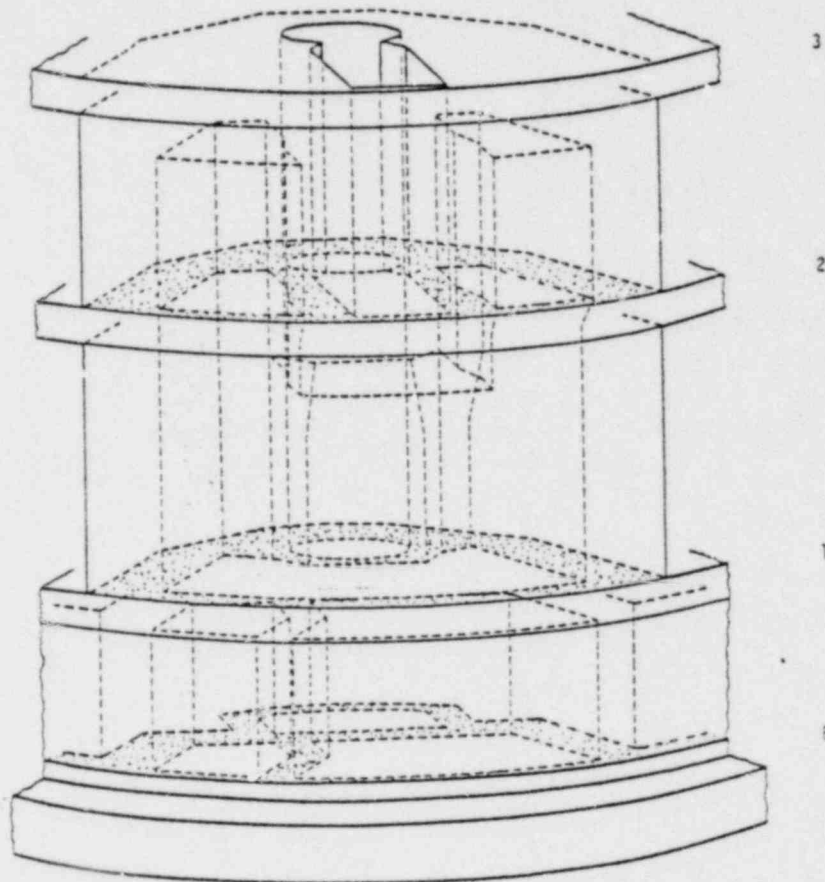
ISOMETRIC VIEW OF CONCRETE CORE STRUCTURE
